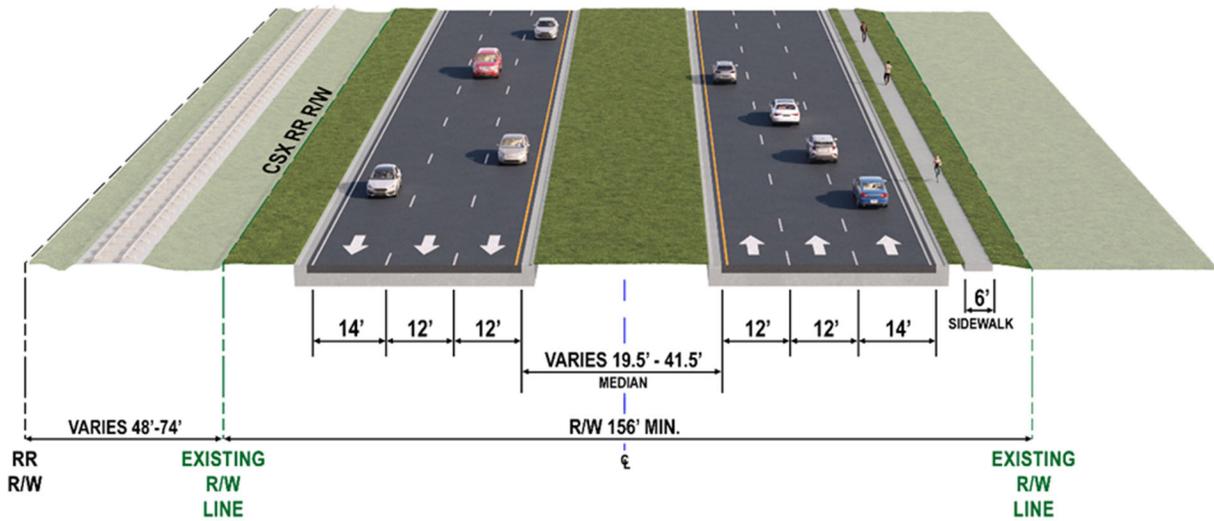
Existing Typical Section – US 41 South of SR 54
